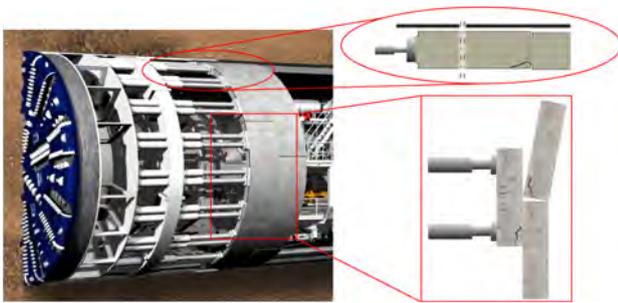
Possible damage patterns in tunnel lining segments during the excavation process.
